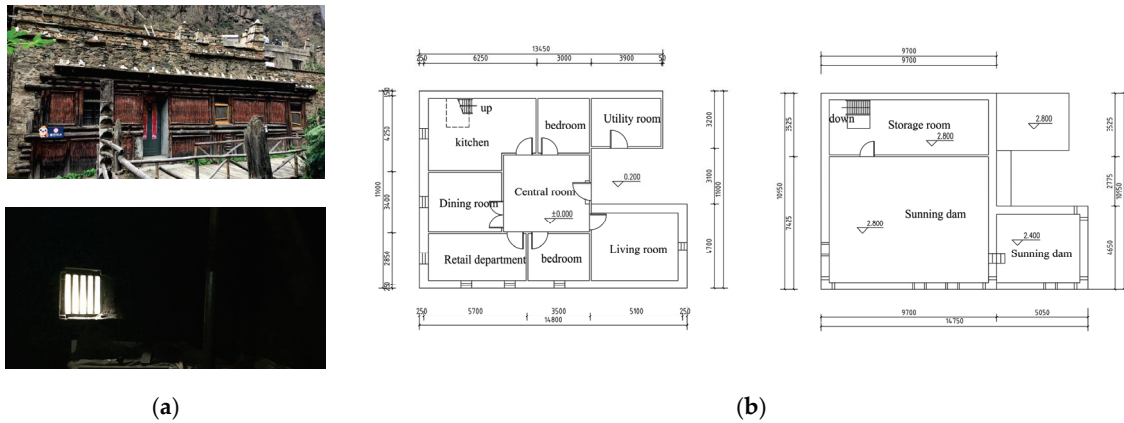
Status and floor plan of the dwelling 1. (a) Current status of residential buildings. (b) Plane diagram.
